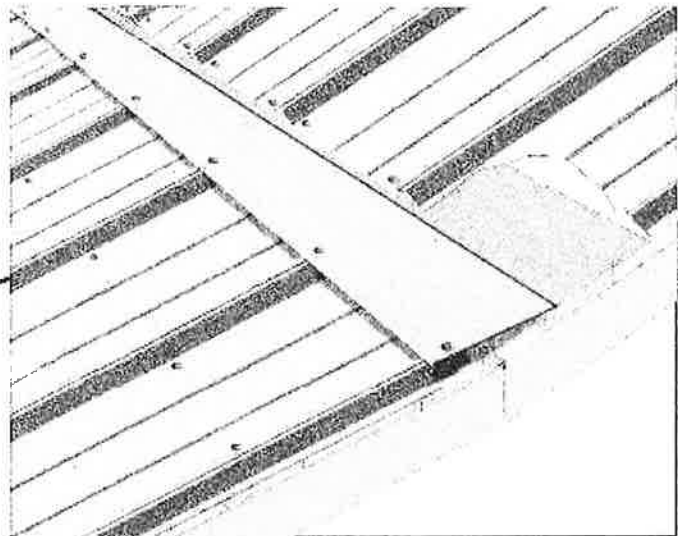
The transition flashing provides a continuous drainage where two slopes meet.
